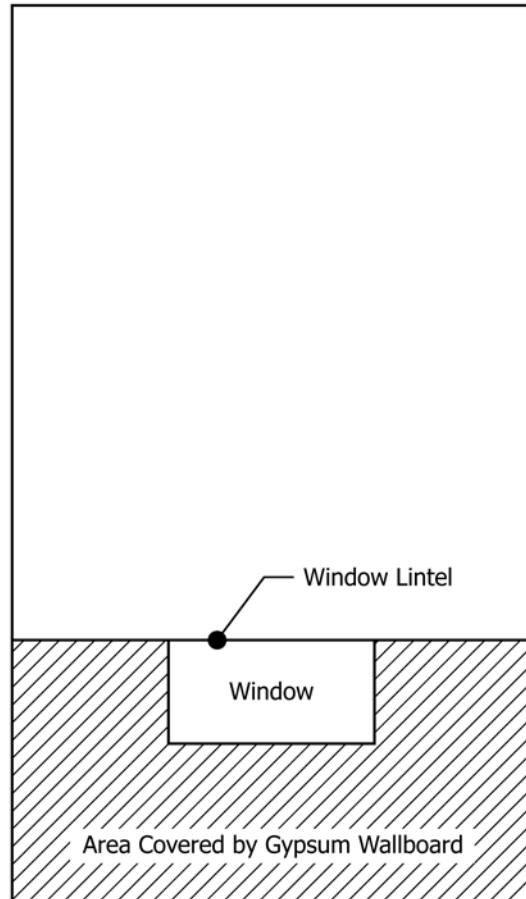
Elevation View of Interior Face of the Exterior Wall Assembly Illustrating Gypsum Wallboard Location (See 7.3.9.1)
